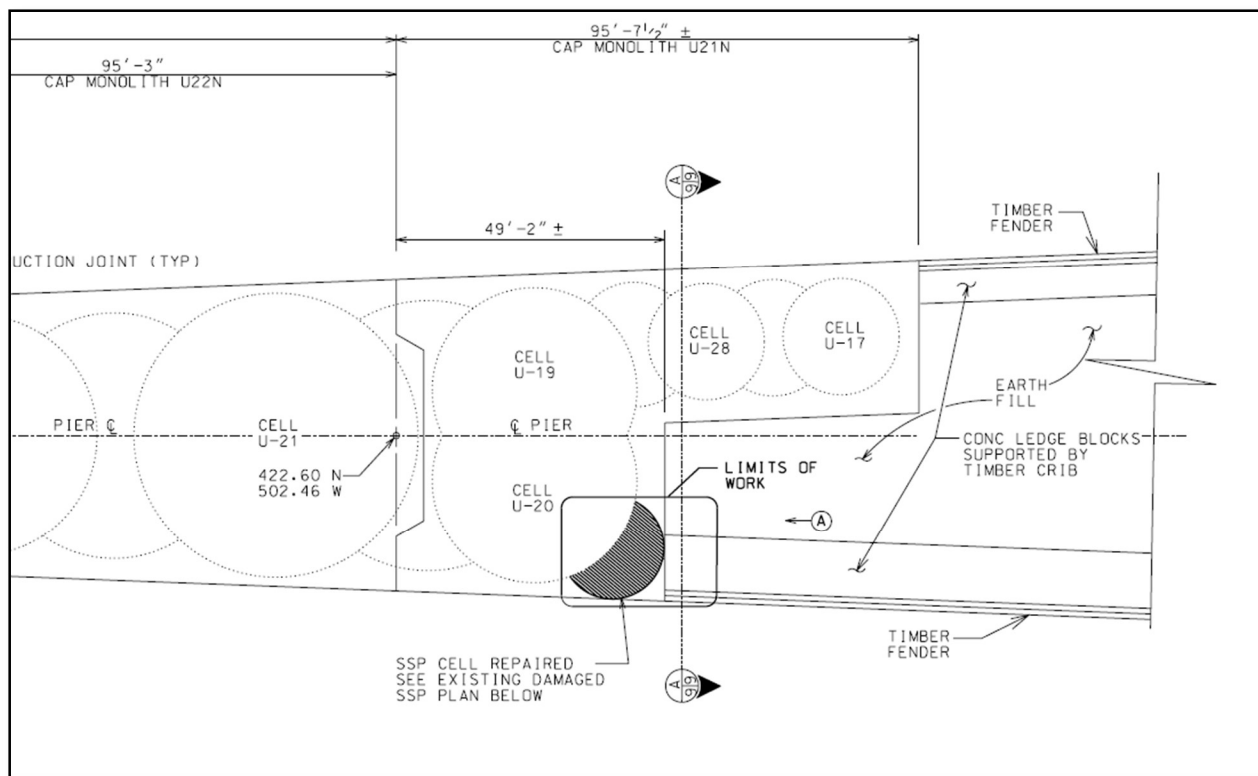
1994 Repair Drawings - Overall Plan (2020 Strike Location)
